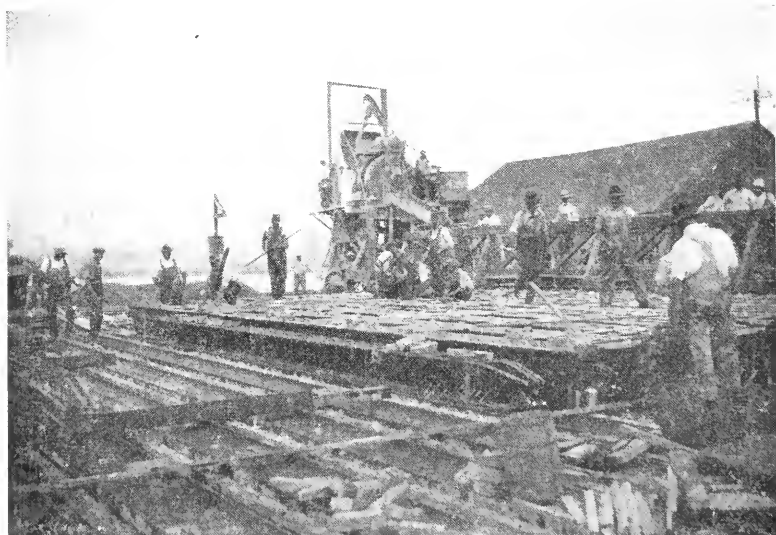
CONSTRUCTION OF CONCRETE PILES.
